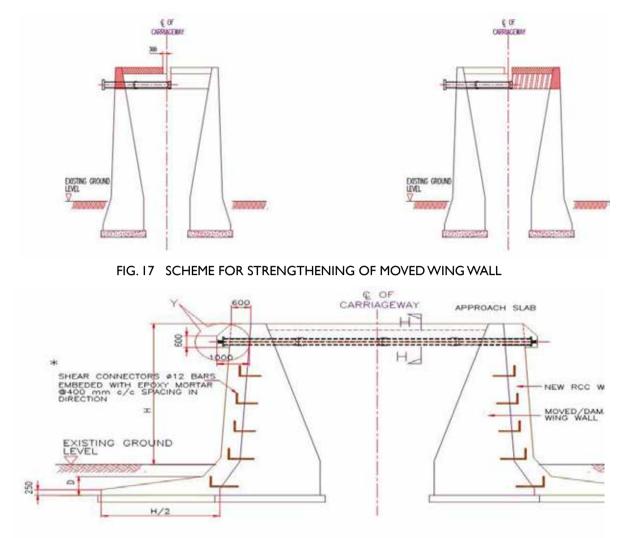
SCHEME FOR STRENGTHENING OF MOVED WING WALL
